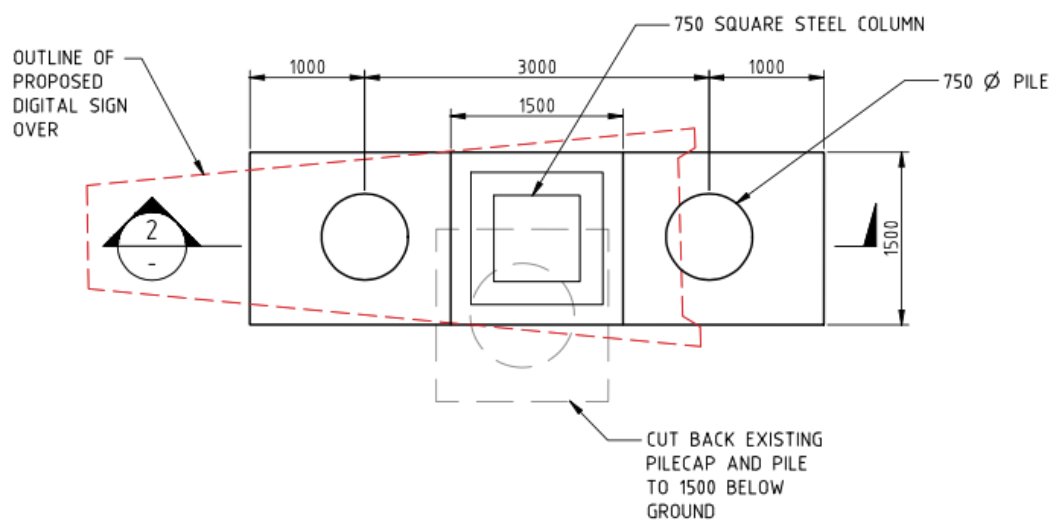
Proposed footing plan (Source: Dennis Bunt Consulting Engineers)
